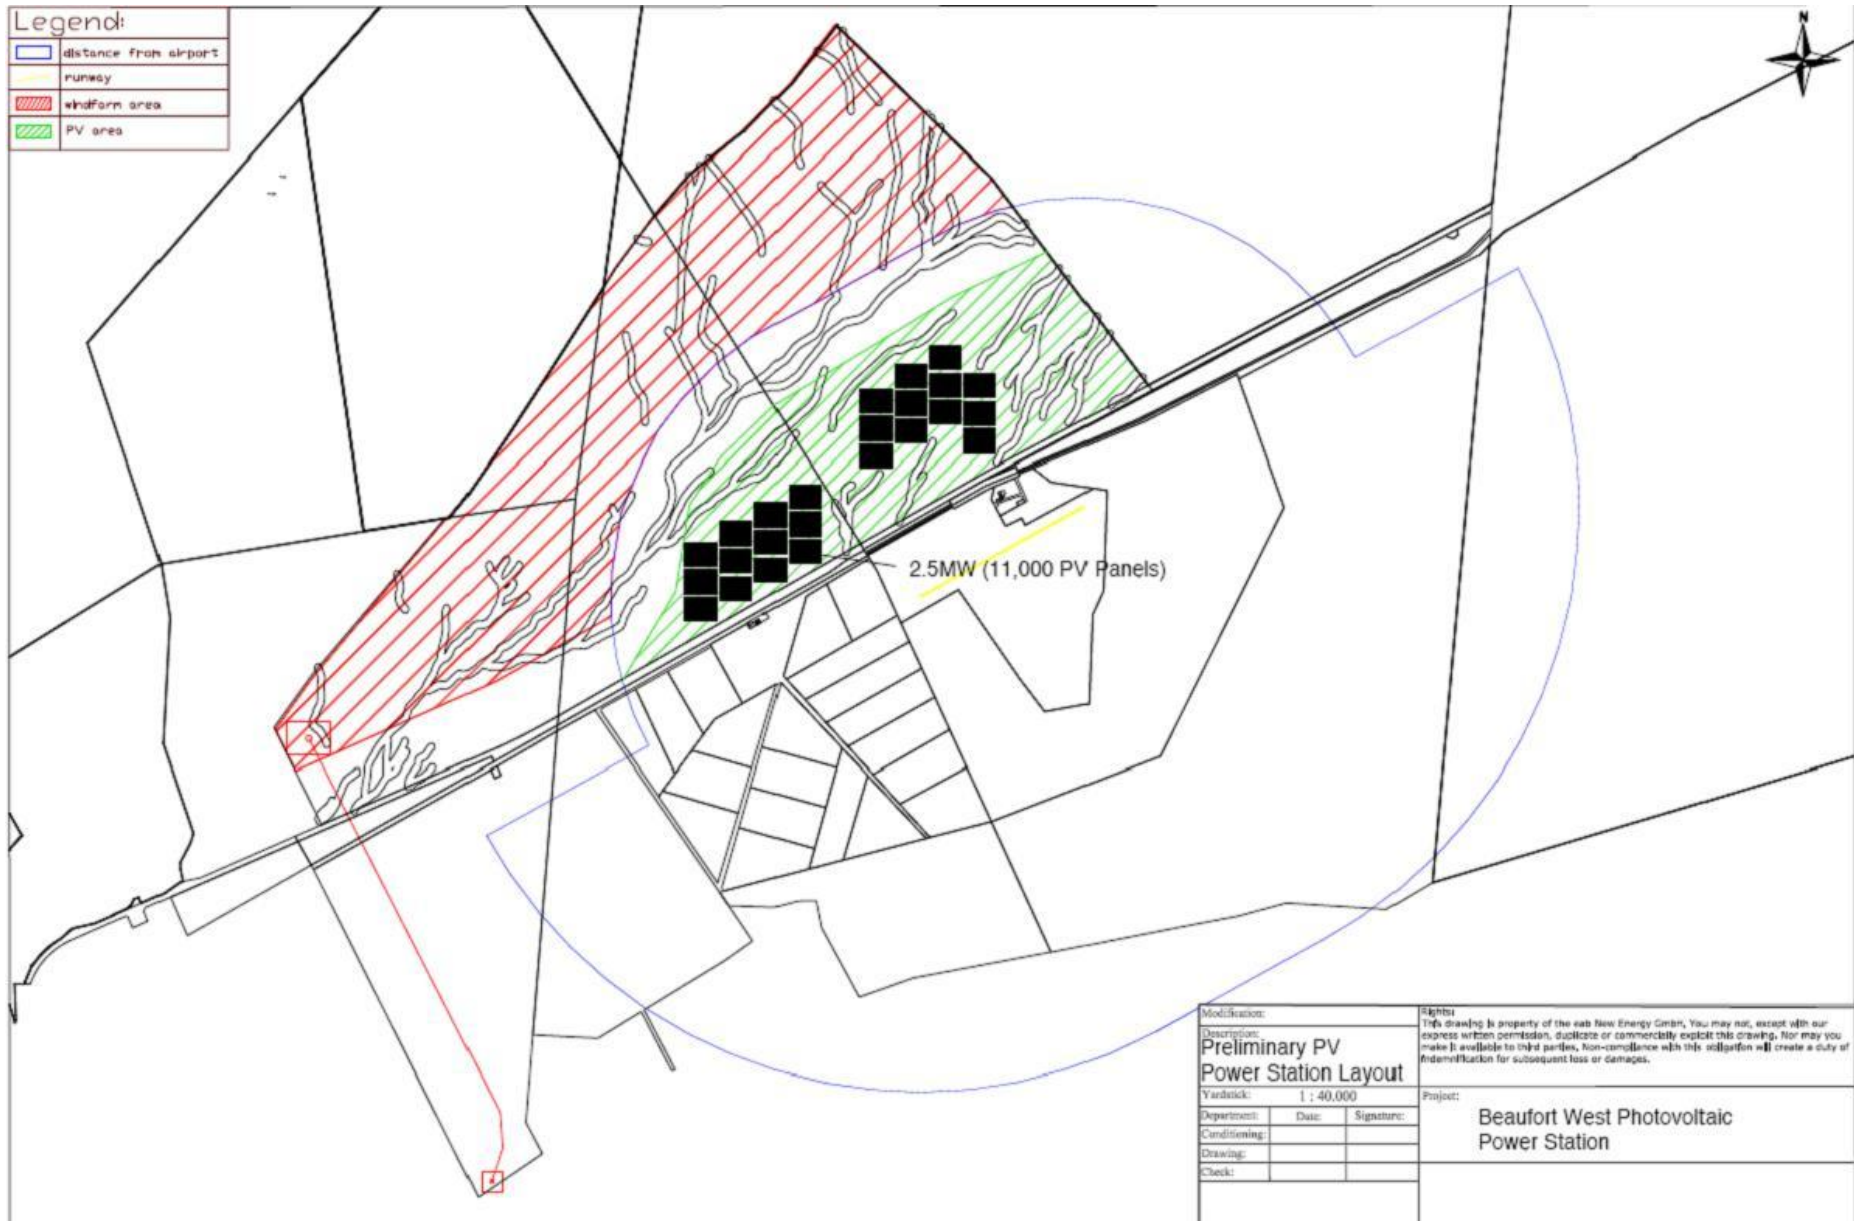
Preliminary layout plan for the proposed Photovoltaic (solar) Park (courtesy of Cape-eaprac).
